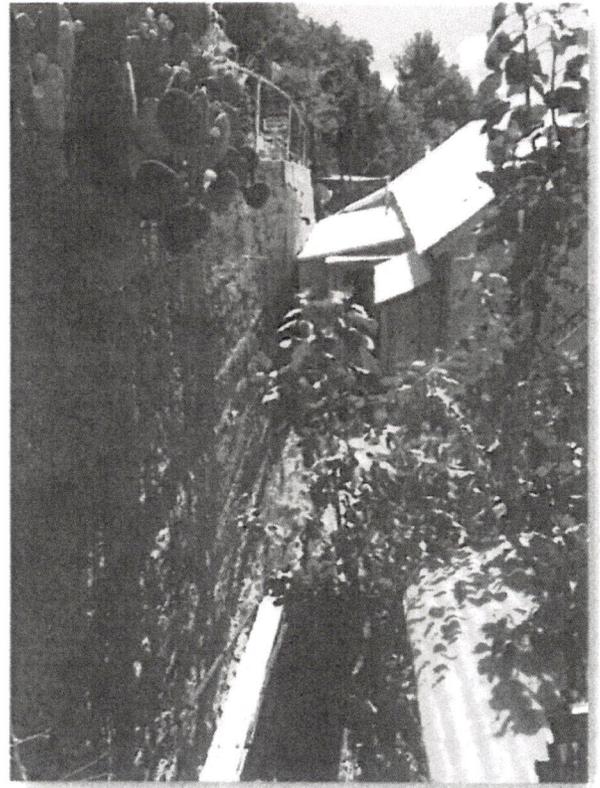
Showing hole adjacent to the wall which allows water to flow into the residence.
